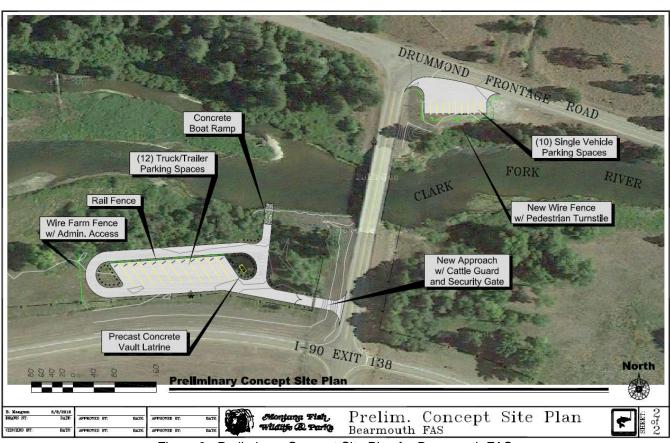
Preliminary Concept Site Plan for Bearmouth FAS
